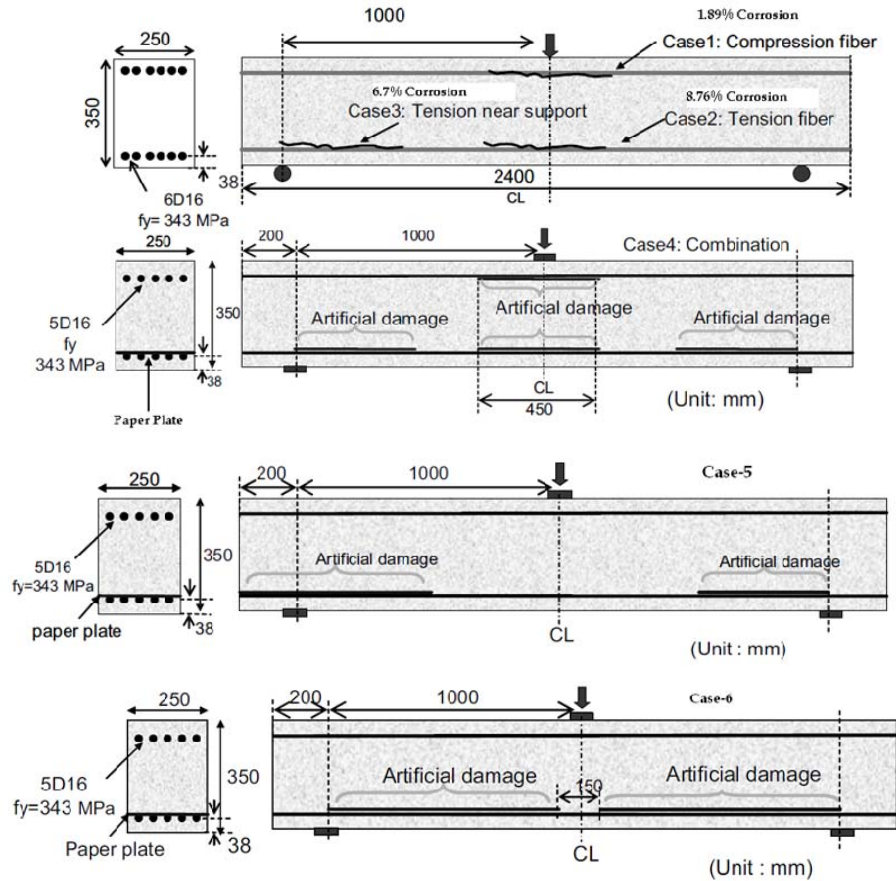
Details of specimens (Toongoenthong and Maekawa, 2004)
